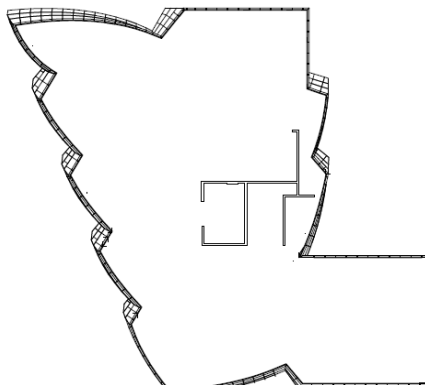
Typical shear wall layout (4<sup>th</sup> floor)
